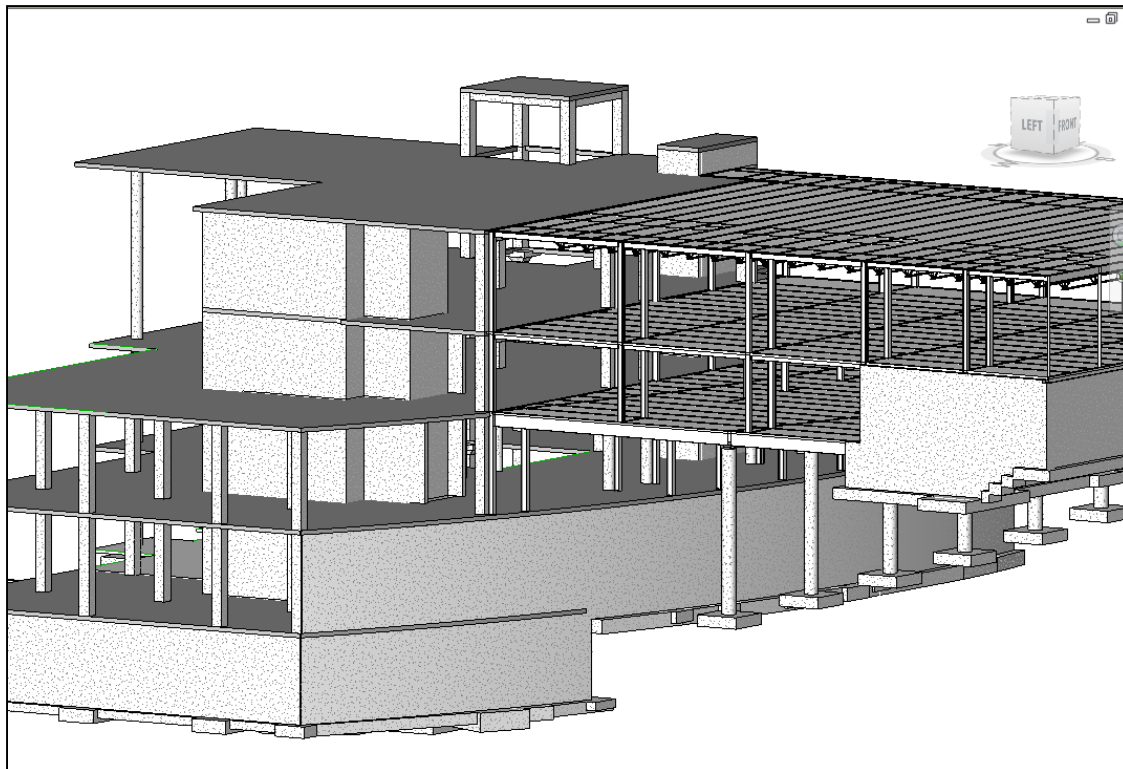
A view from a Southwest angle depicting both the concrete steel and concrete structure.
